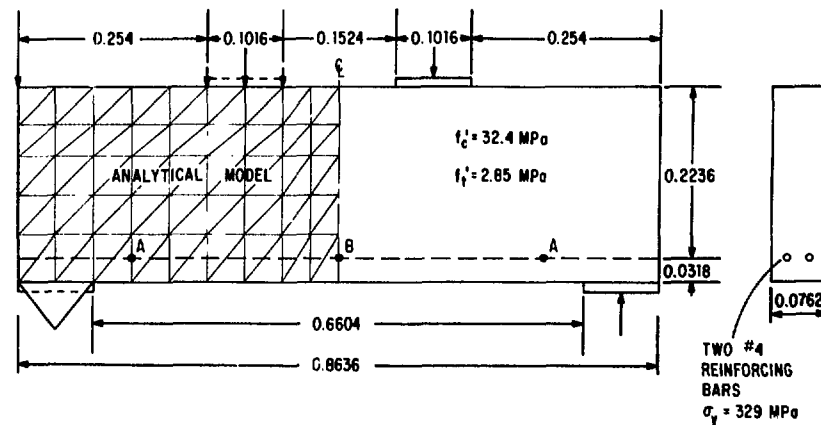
Details of the Concrete Test Beam and the Analytical Model.
